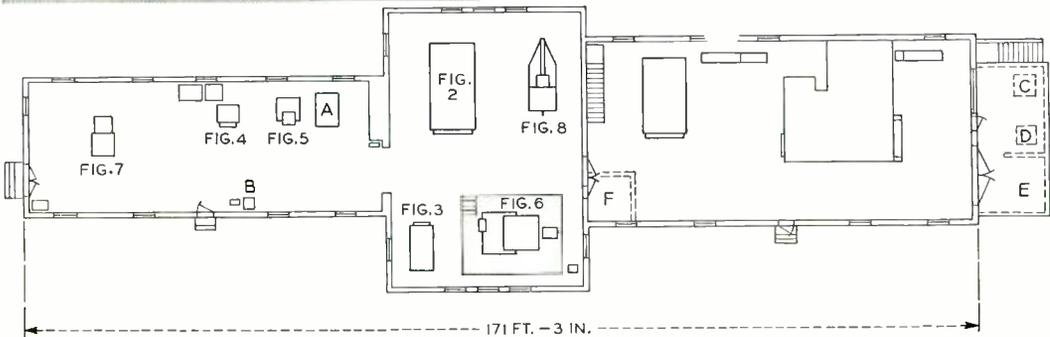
Floor plan of the Whippany Test Laboratory; A—Portable temperature chamber; B—Electric oven; C—Salt-fog cabinet in basement; D—Salt-spray cabinet in basement; E—Pressure-testing room in basement; F—Dark room in basement
